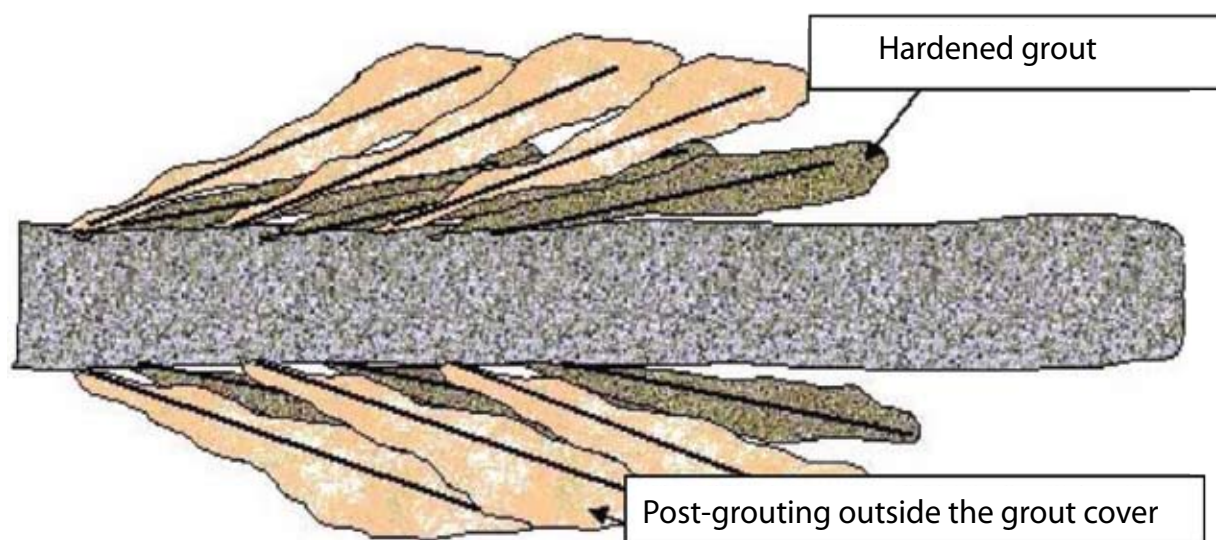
Principle for the execution of post-excavation grouting. Holes for post-excavation grouting should be drilled in the opposite direction of the pre-grouting holes.
